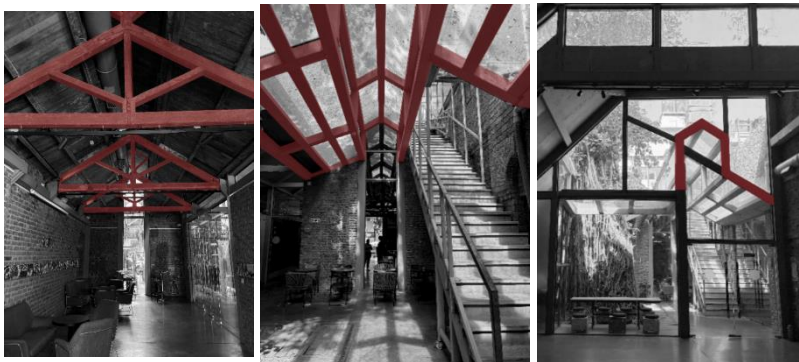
The distinct roof profile of the substation has been highlighted by extending it from the substation through the courtyard to the glass accent wall of the cathedral.
